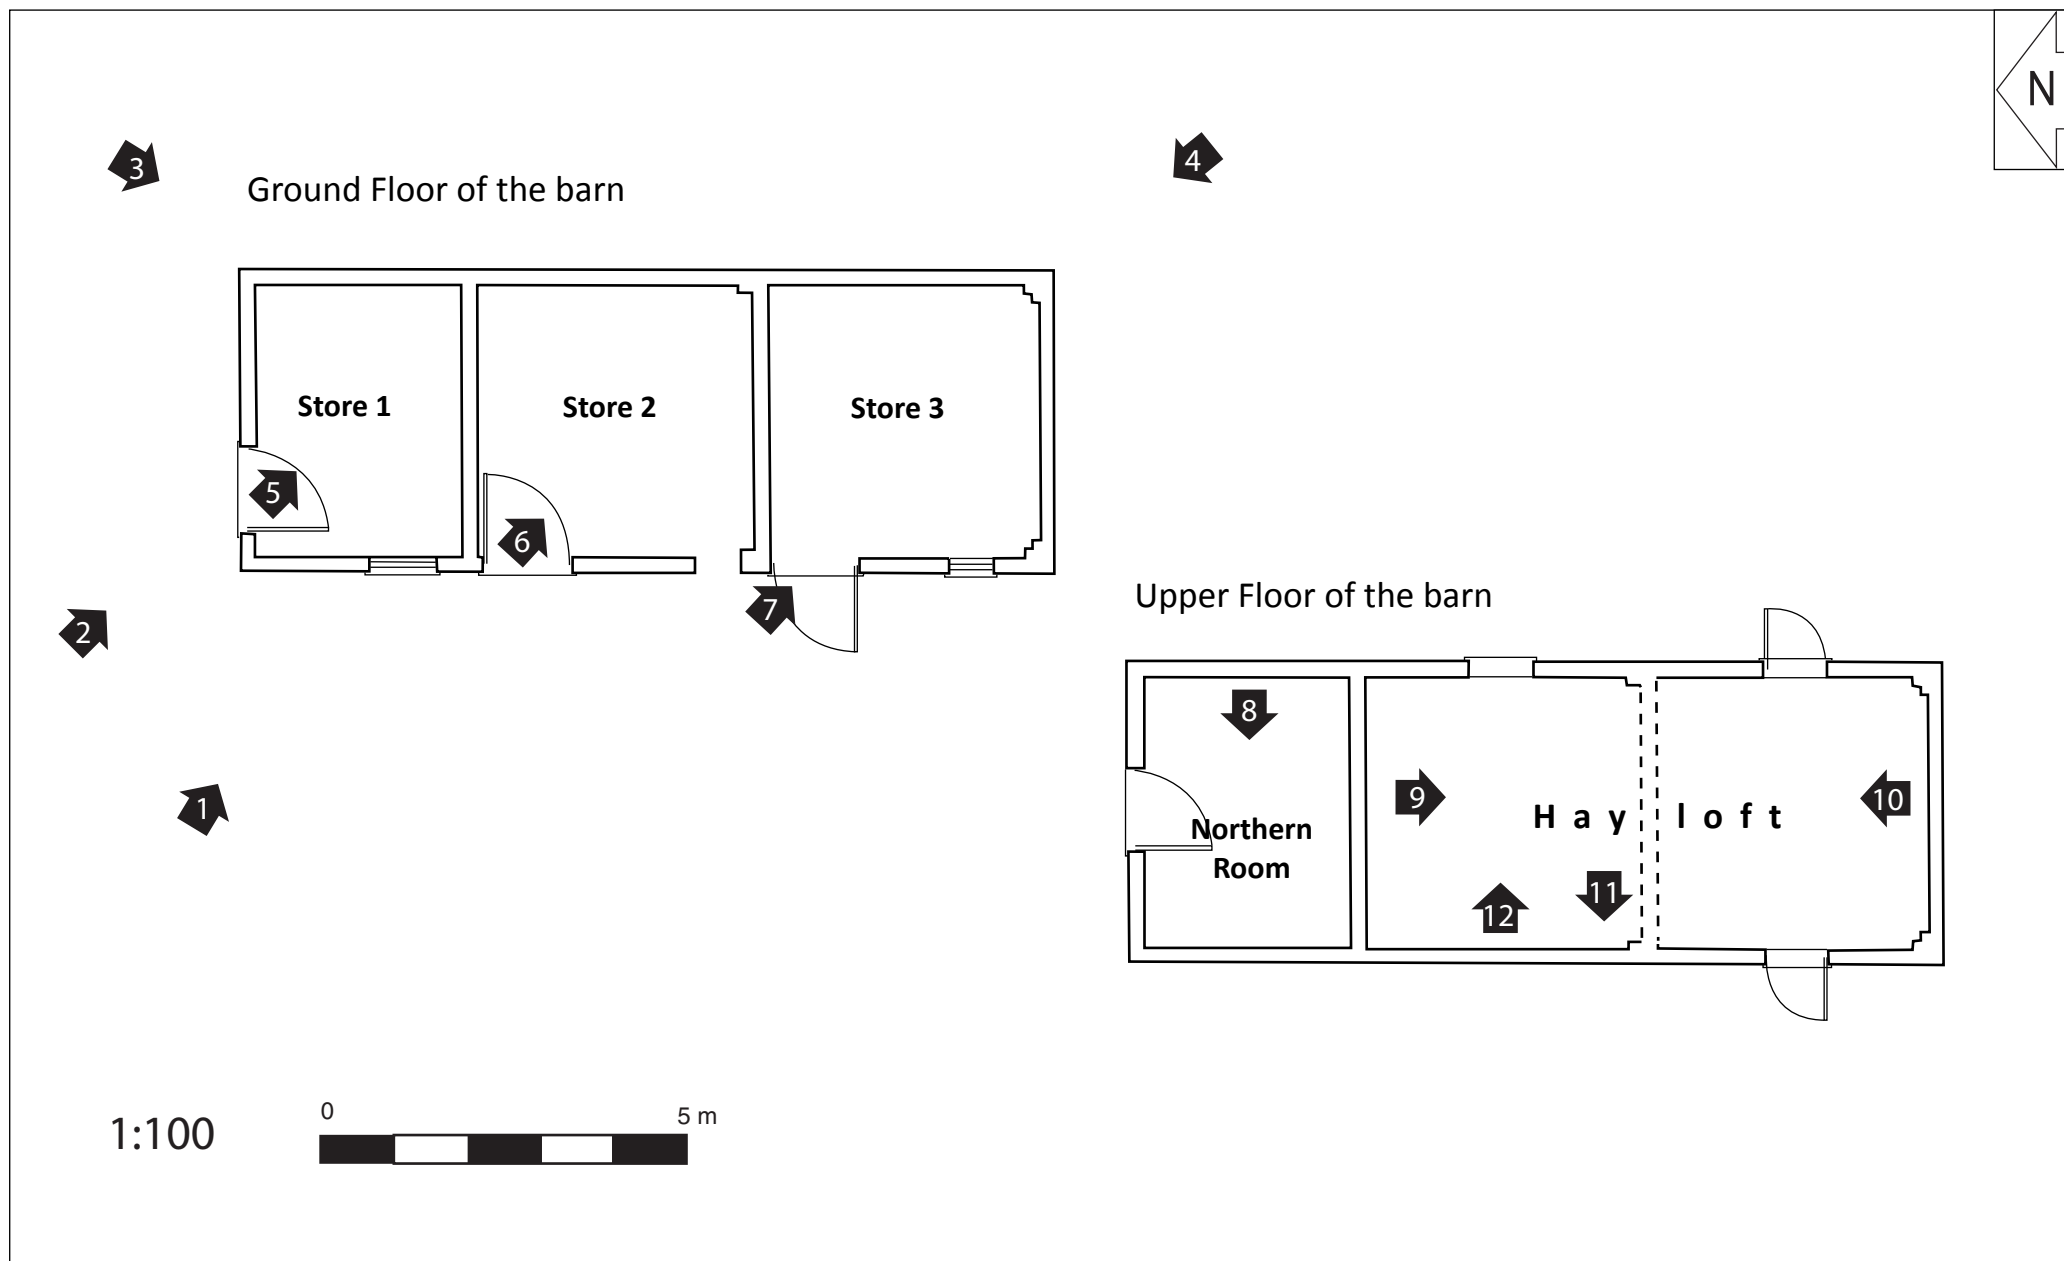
Building plan showing direction of photographs Ash Barn, Audlem
